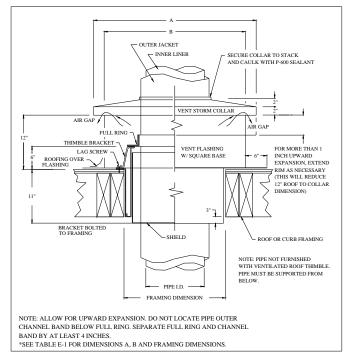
Installation of Ventilated Roof Thimble (P-MVT)
